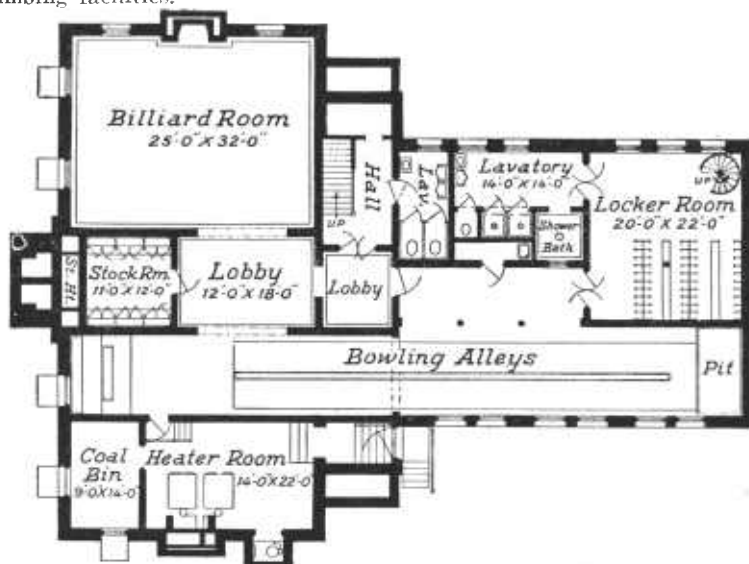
Basement plan, Lebanon building. (By courtesy of C. W. Bixby, architect.)
